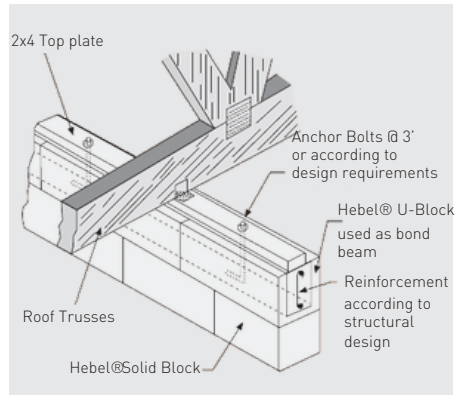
A: Anchoring wood top plate to U-Block top bond beam.
